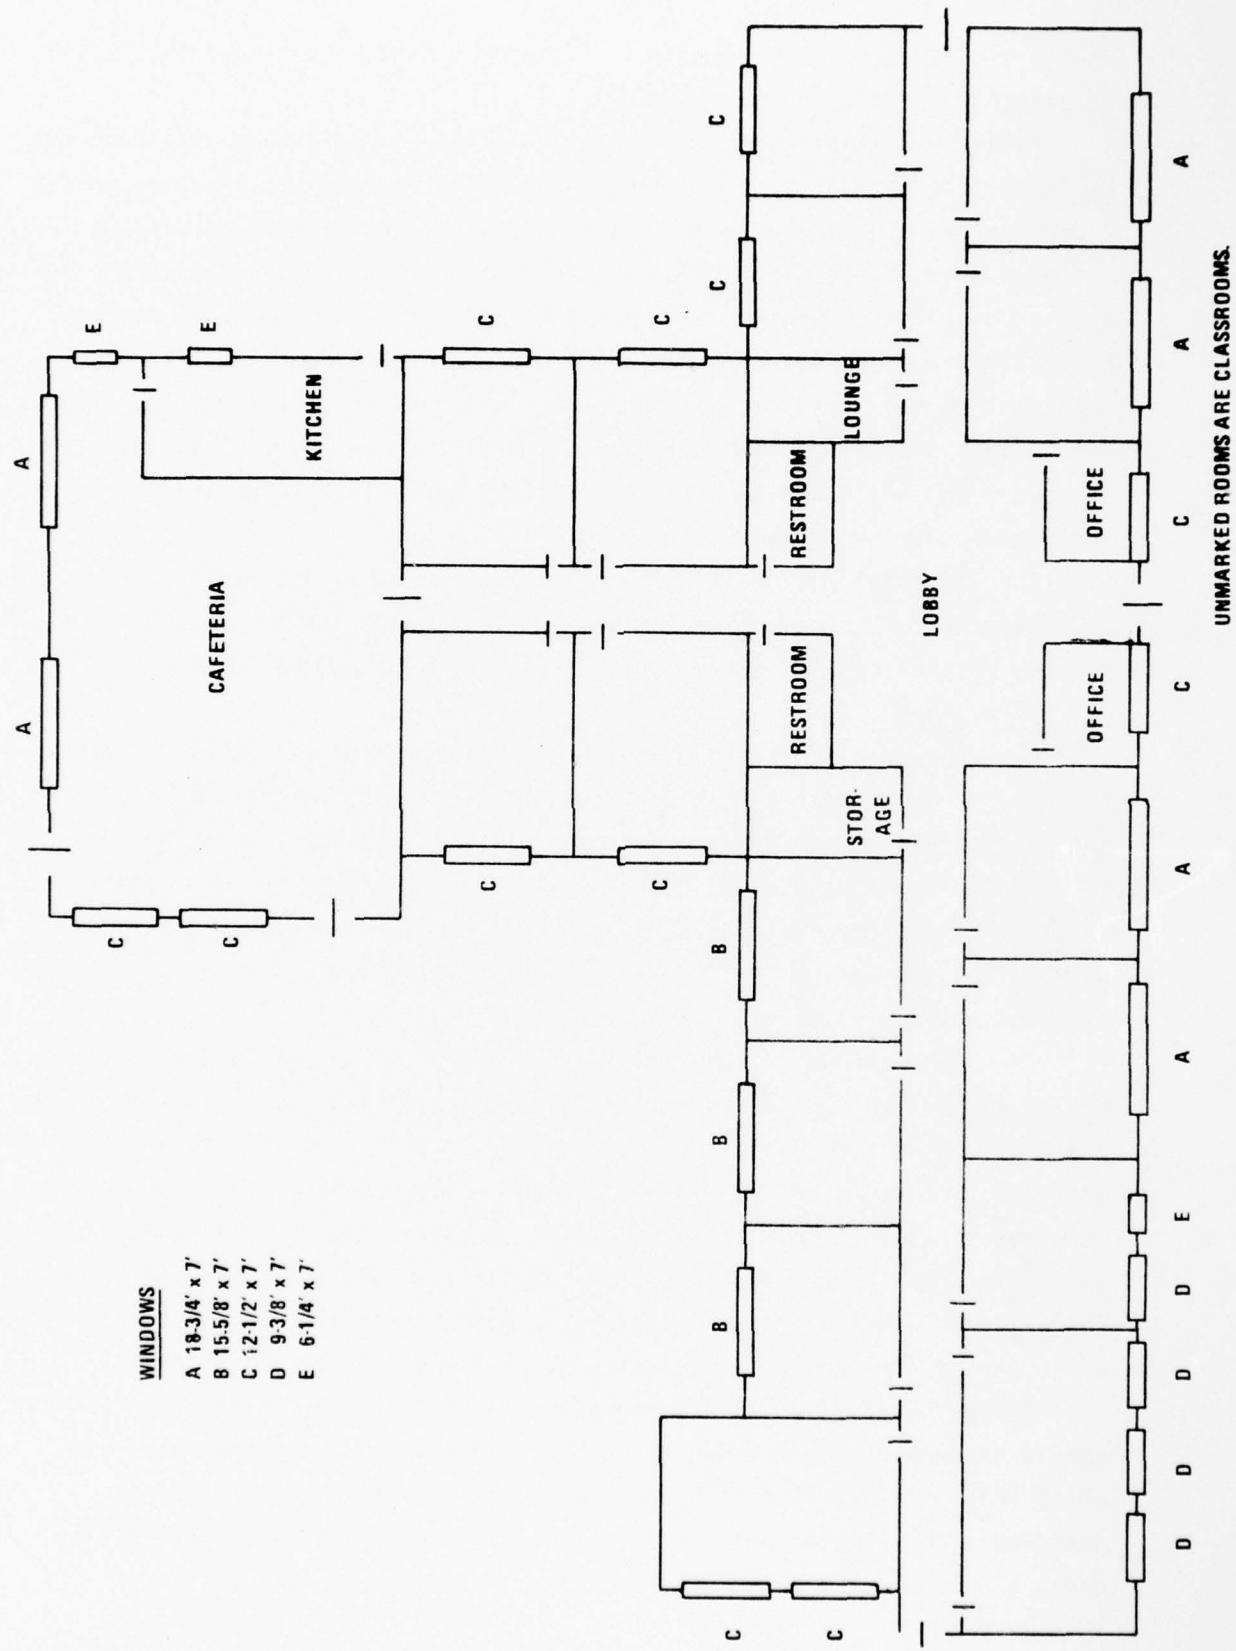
FLOOR PLAN OF MADISON SCHOOL
